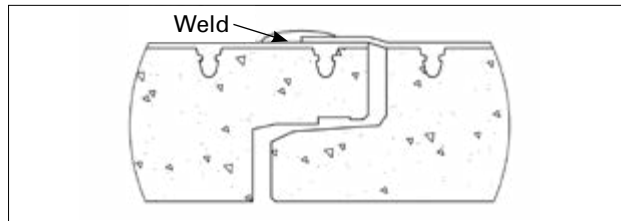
HyLiner lined SRJ pipe (Lapped Joint)
